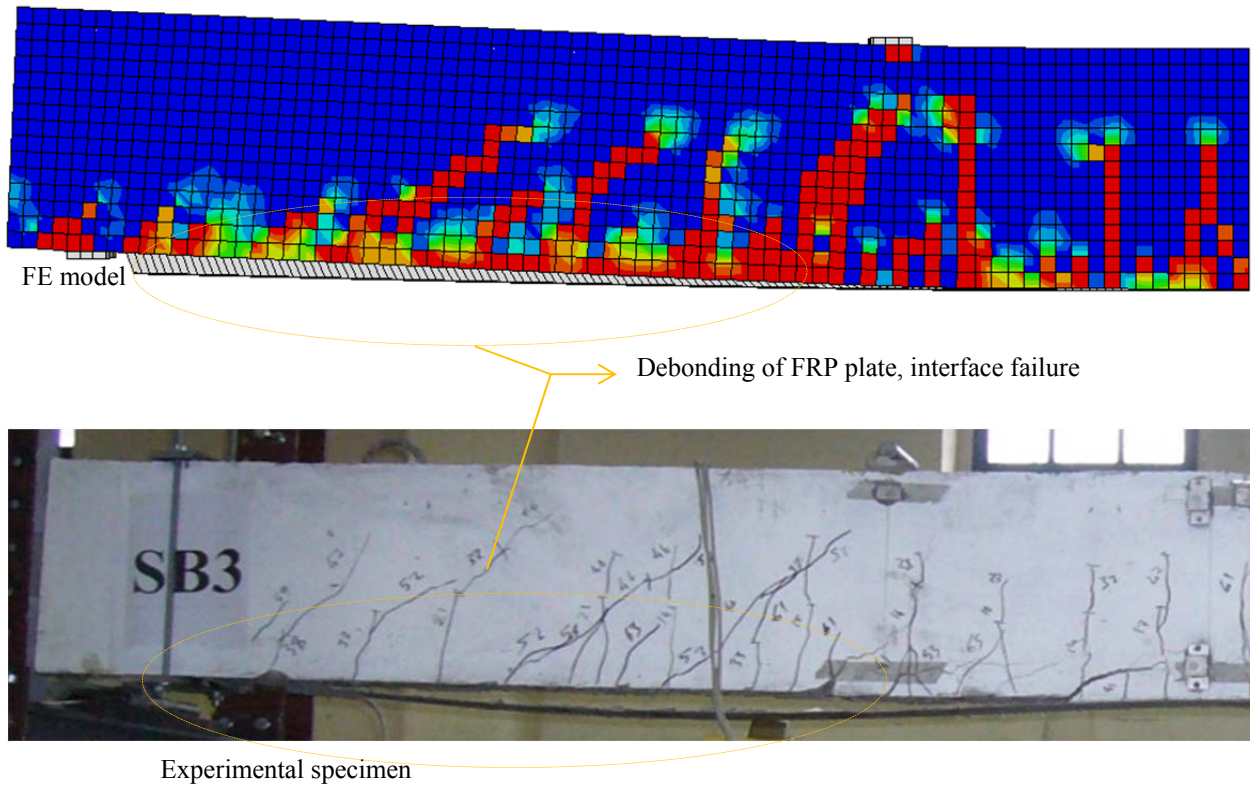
FE crack patterns for interface separation of CFRP-strengthened RC beam.
